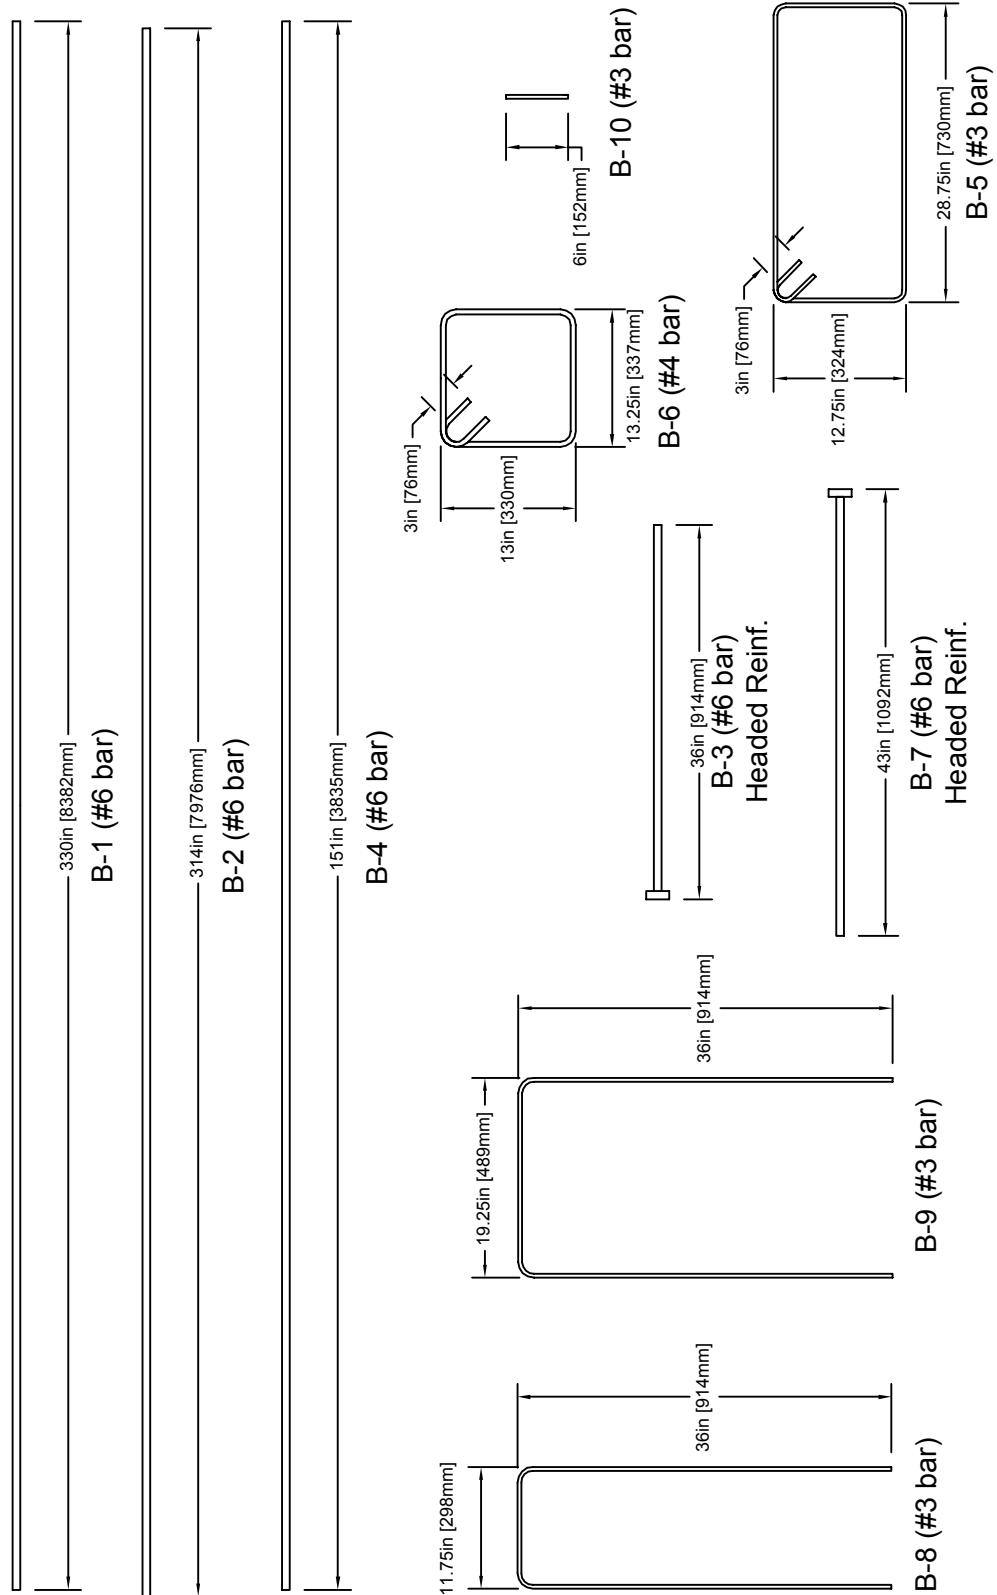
Bridge Plans Sheet 22; Steel Details 4.
